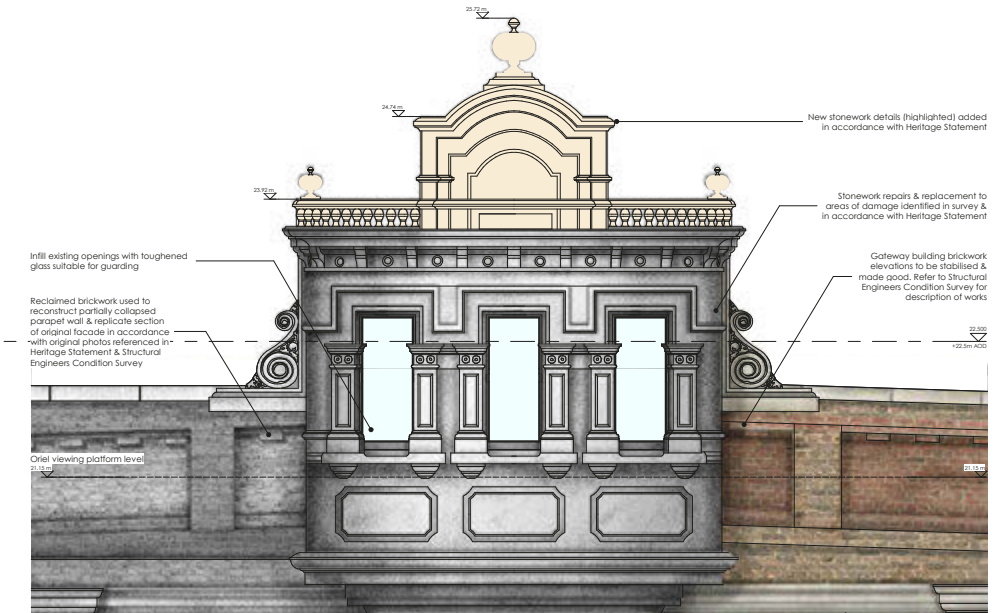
Elevation showing proposed restoration works to the Oriel
